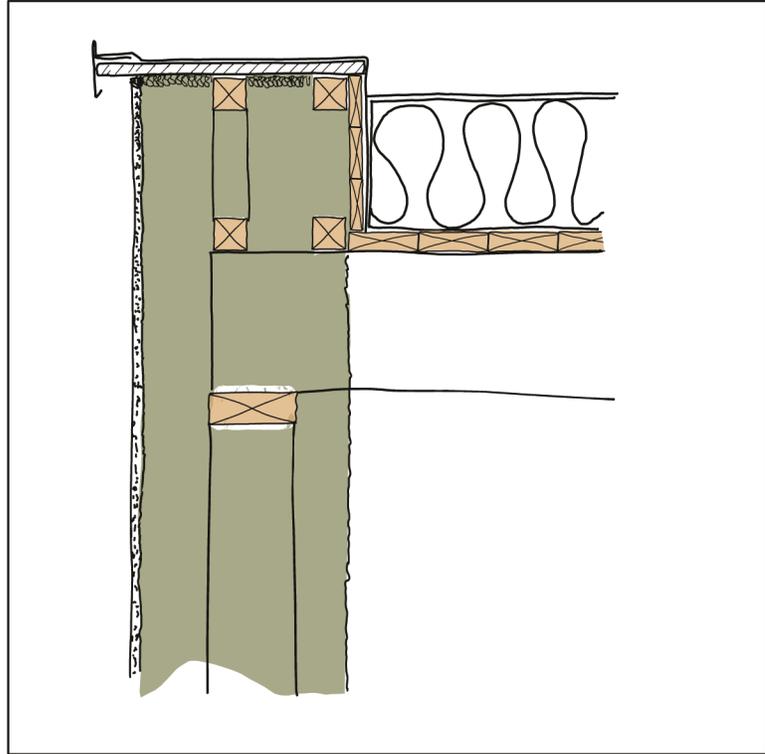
The airtight junction at the eaves of a flat roof with a warm roof build-up. Exposed hempcrete wall finish and exposed structure. (Stanwix and Sparrow 2014, 326)
